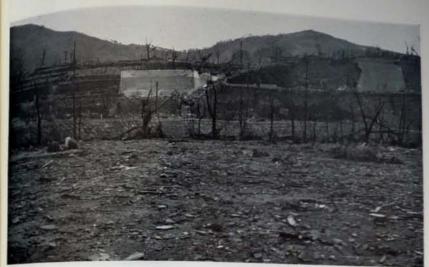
Looking south from Ground Zero. Crude retaining walls were smashed and the hillsides have given away.
